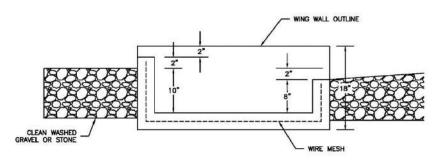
Biofiltration Swale Plan and Section View Source: Adapted from WSDOT (40)
